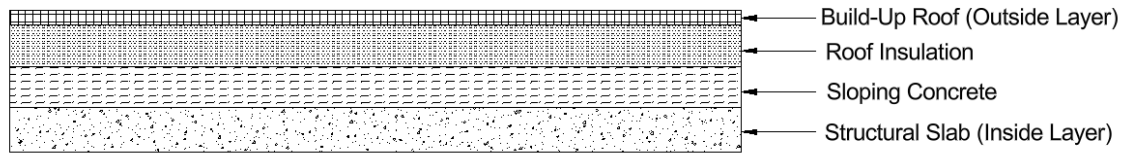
The Construction Design for the Montpetit Hall Roof
